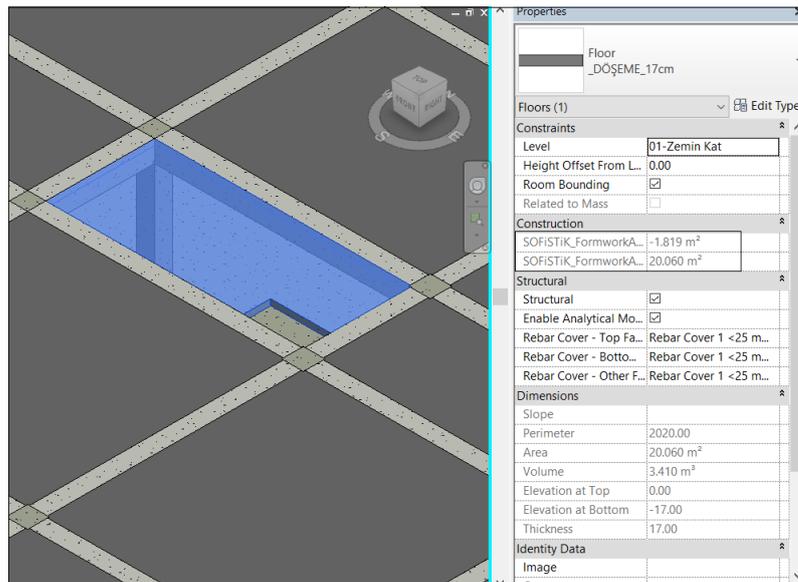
Incorrect Formwork Area of D138 Floor Having Shaft Opening in Revit Model
